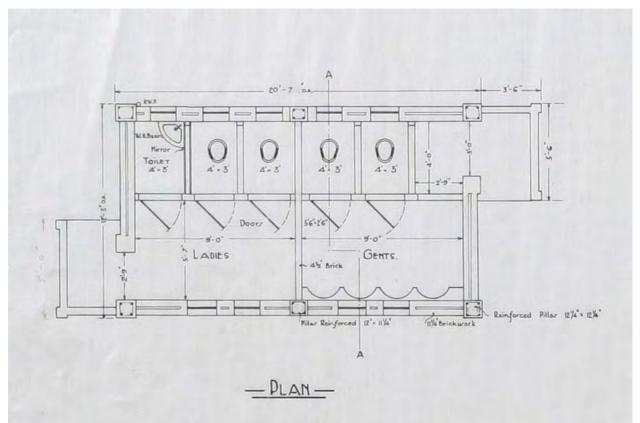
1930 plan detail of internal layout (Auckland Council, 1930)
